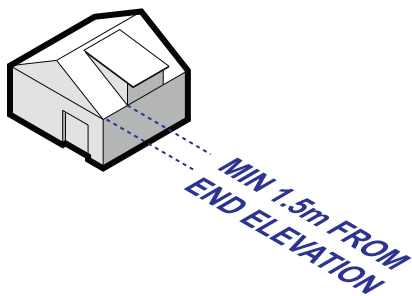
To manage scale, dormers should be sloped and be set back from the end elevation.
